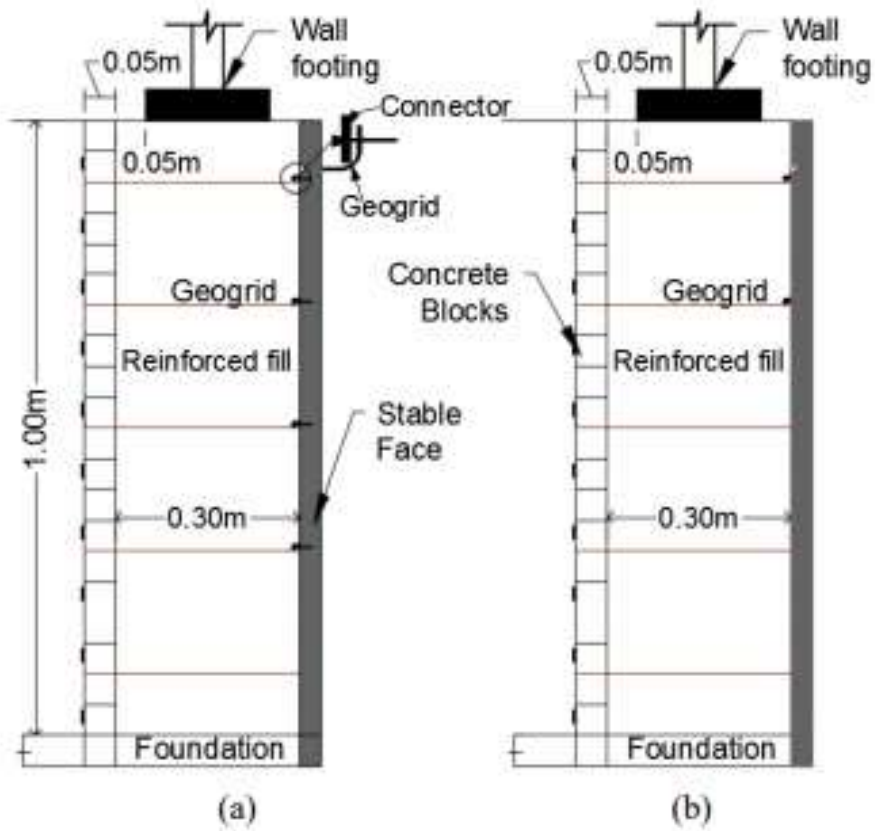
Test layouts from the models with reinforcement layers fixed to the stable wall at the rear. (a) connection of four layers (b) connection of upper two layers (Kakrasul., 2018)
